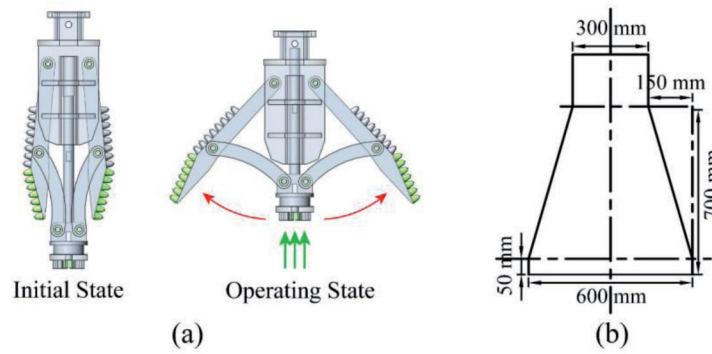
Bell-Shaped Enlargement Form of Micropiles: (a) Schematic of the enlarged head principle; (b) Enlargement dimensions
